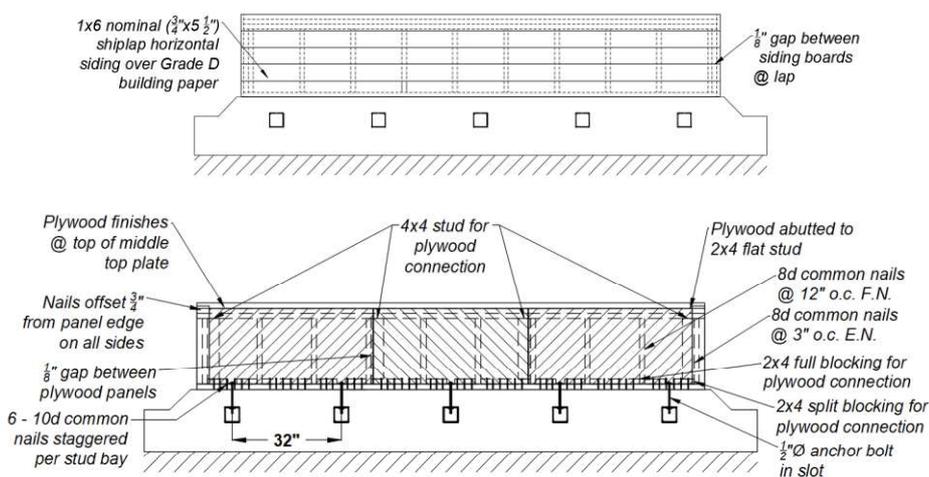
Elevation views of 2-ft-tall cripple walls with horizontal siding; existing condition (top) and retrofitted condition (bottom) [5]
